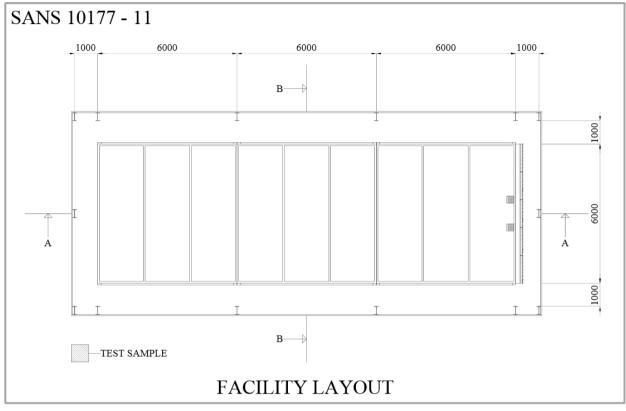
SANS 10177-11 facility plan view for vertical test
